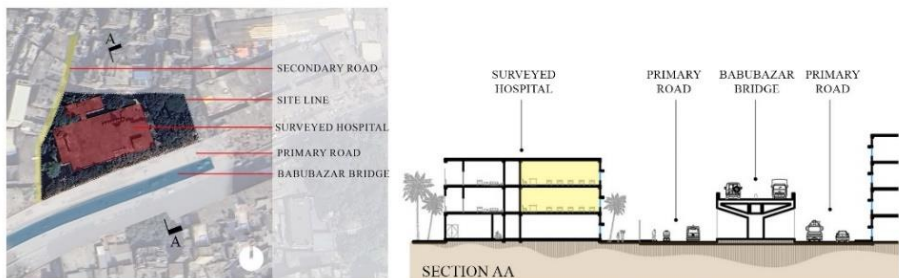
(a) Site plan of surveyed hospital, (b) Section of hospital with adjacent road and bridge.
